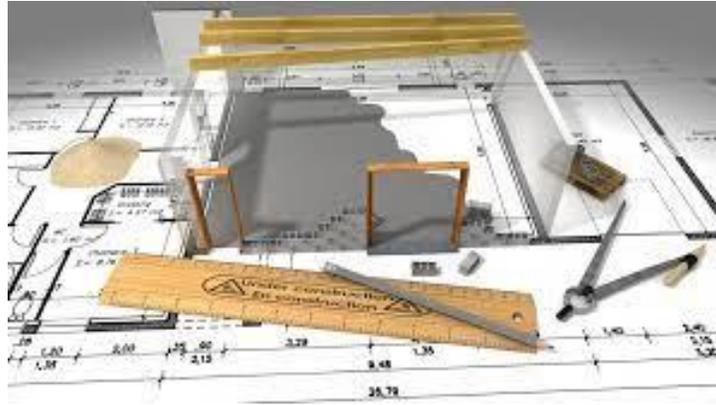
2D CAD Services: Is 3D Drawing Cutting Out 2D from Use
